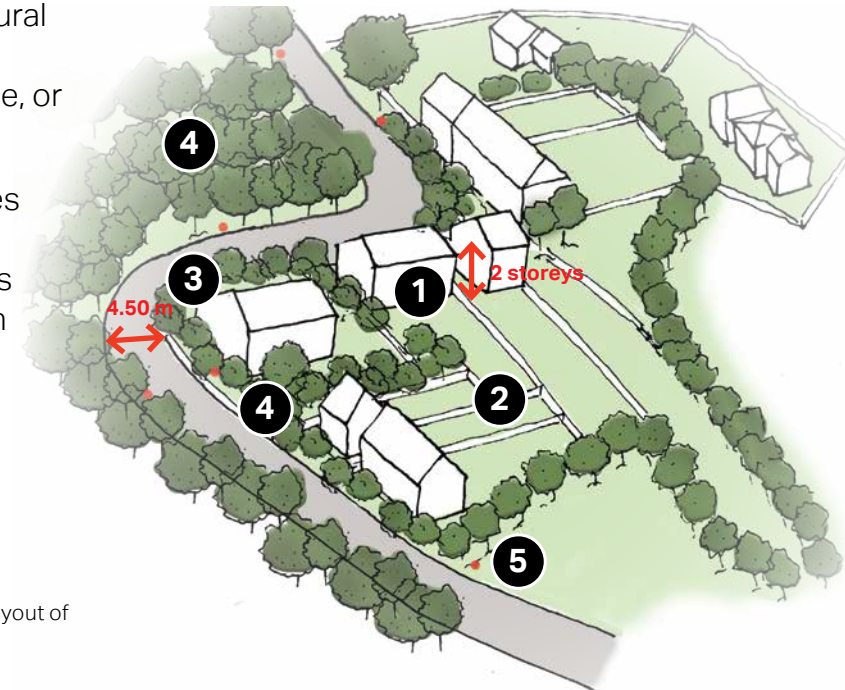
Illustrative plan for a rural edge development highlighting design elements, related to the pattern and layout of buildings.
